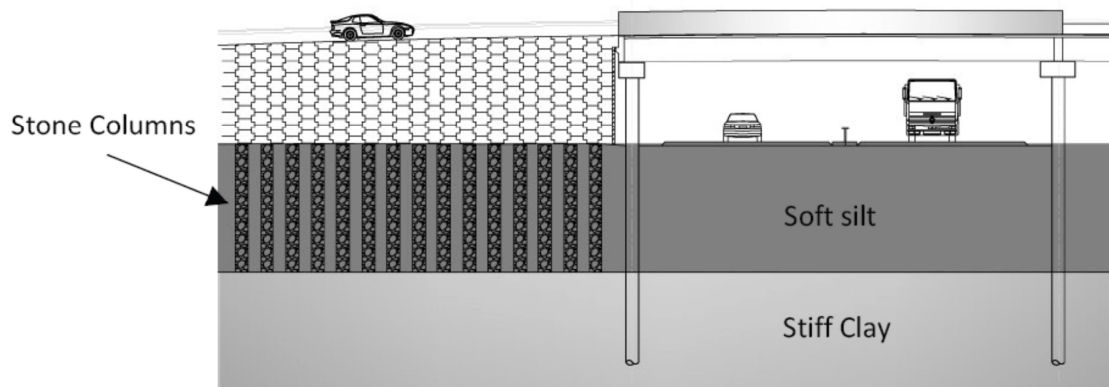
Aggregate columns placed beneath MSE walls on the Pantai Dam Interchange from Raju (2009).
